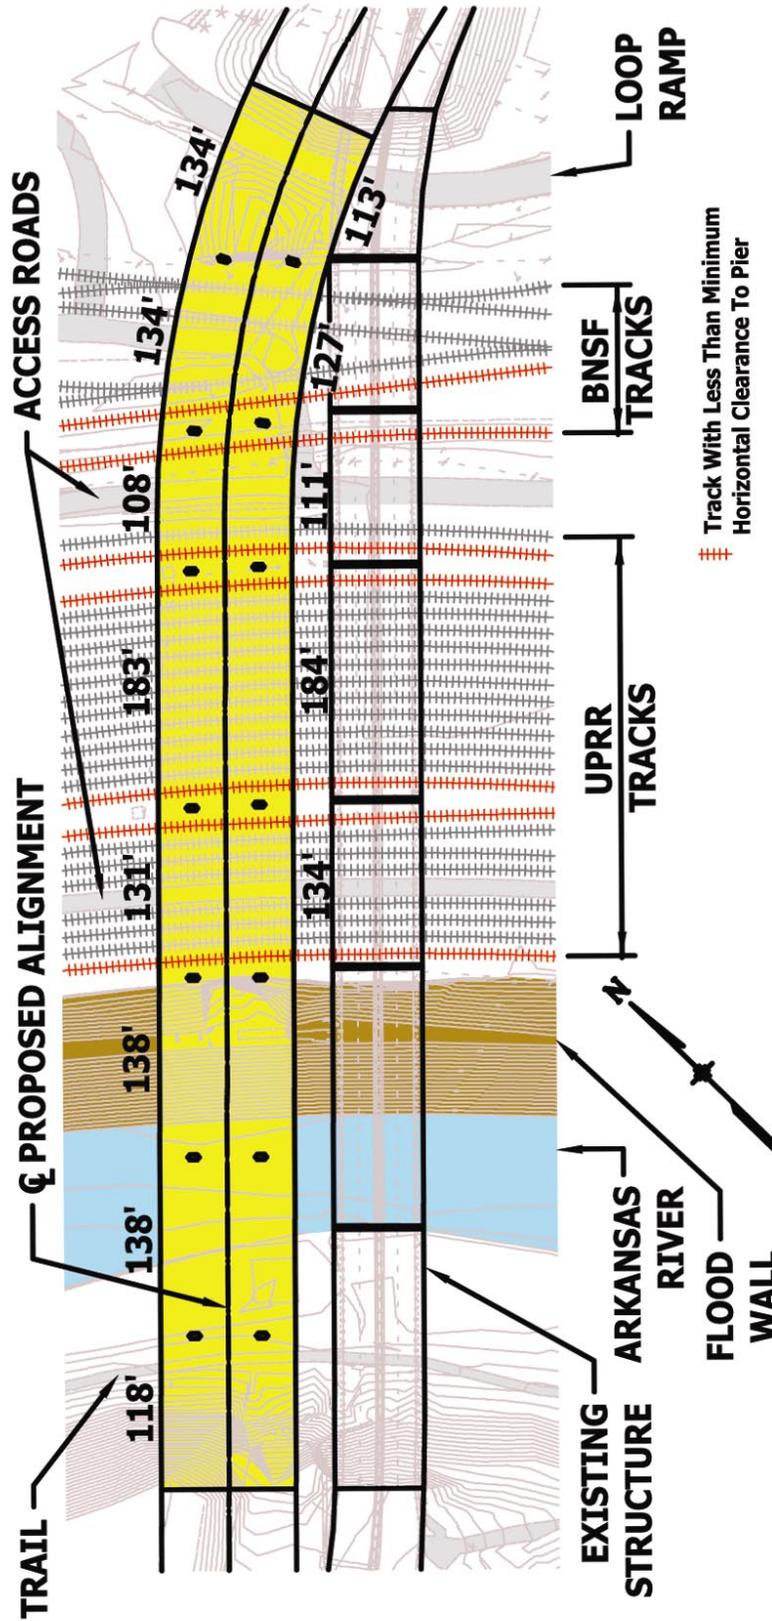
Match Existing RR Spans w/ Modified River Spans - Plan
